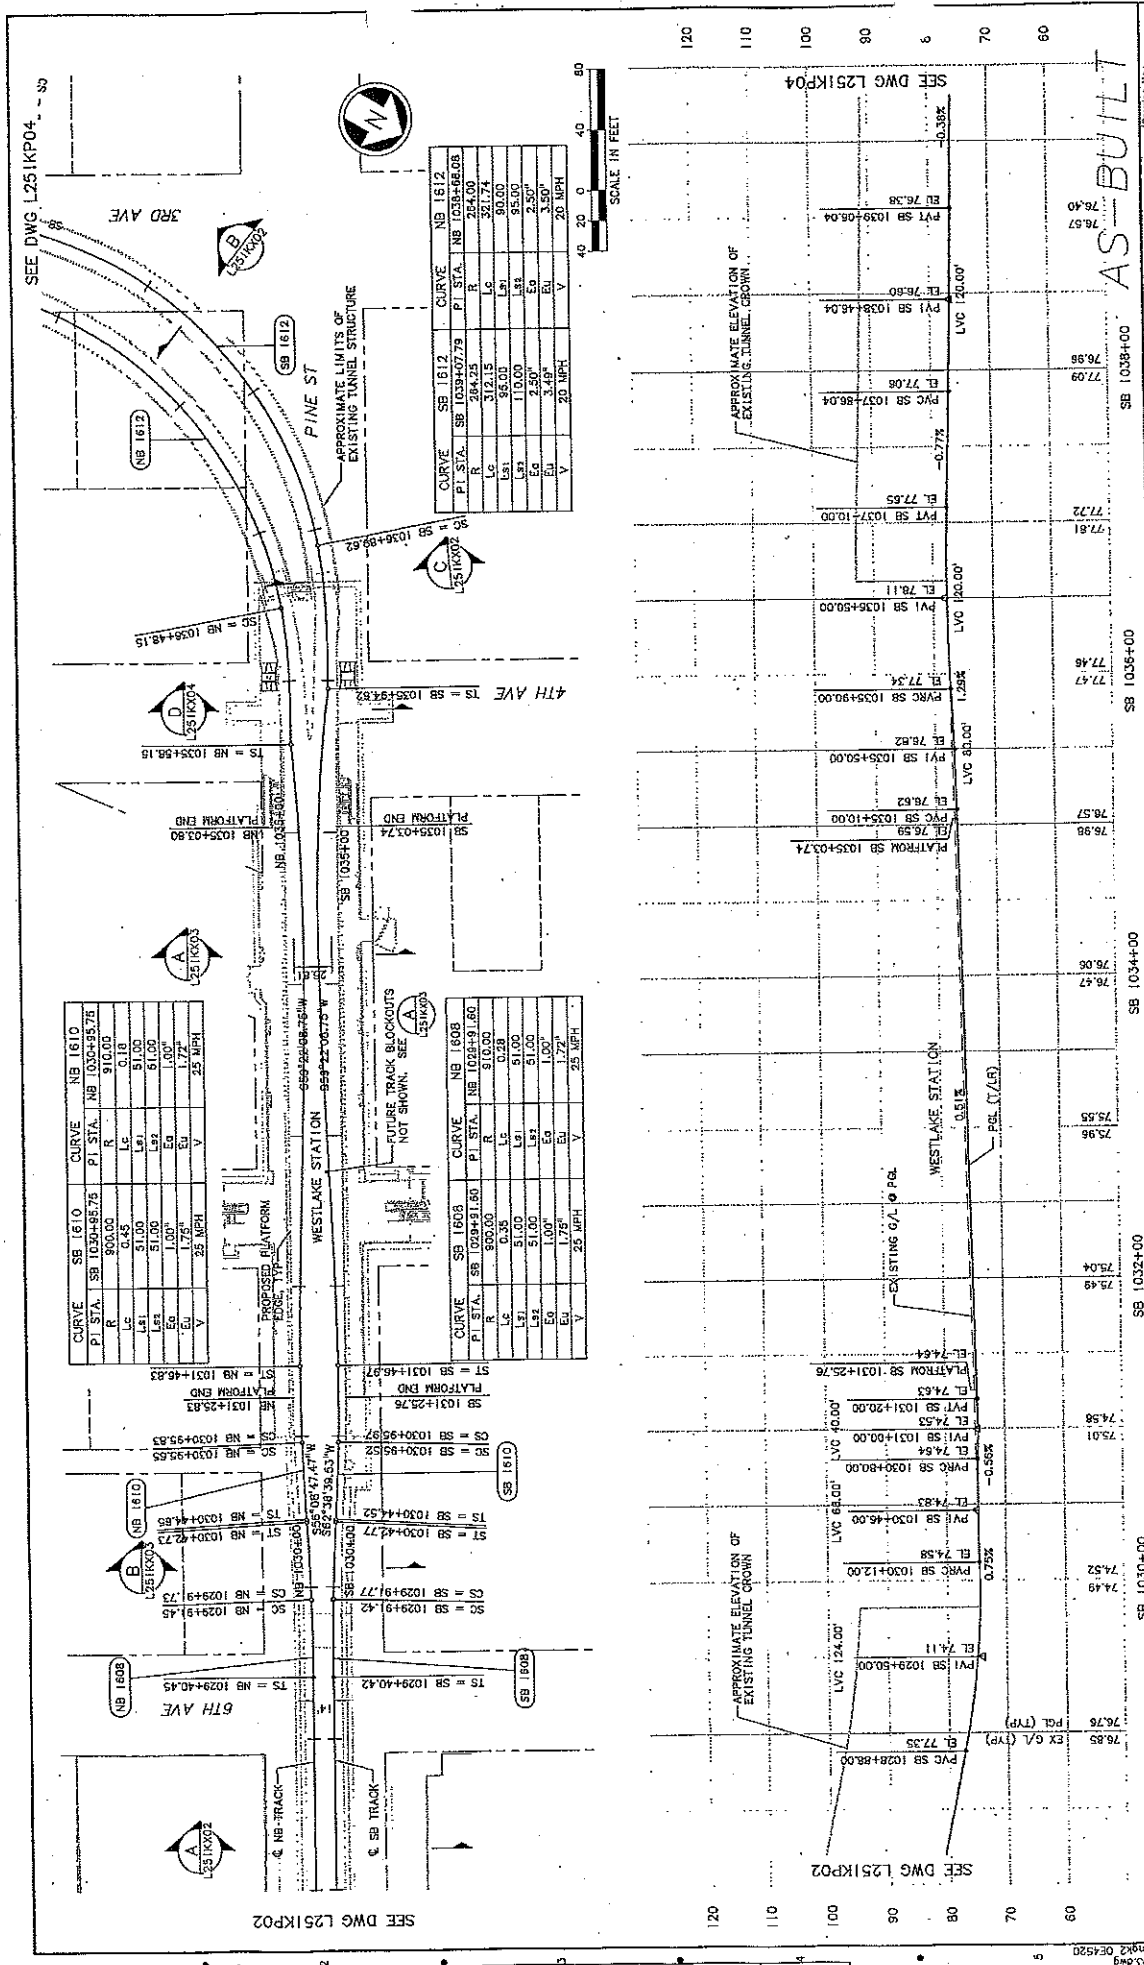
IKP02 Vertical Curve No.: 23-510 Sheet No.: 42		LINK LIGHT RAIL PROJECT CENTRAL CORRIDOR TRACK PLAN & SB PROFILE STA SB 1024+22.40 TO STA SB 1028+50
